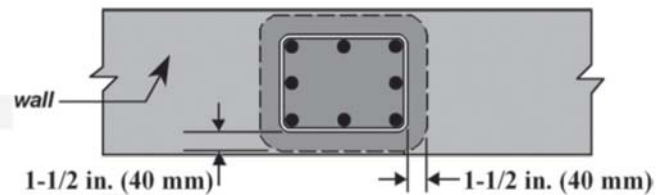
Effective cross section of columns built monolithically with a wall.
